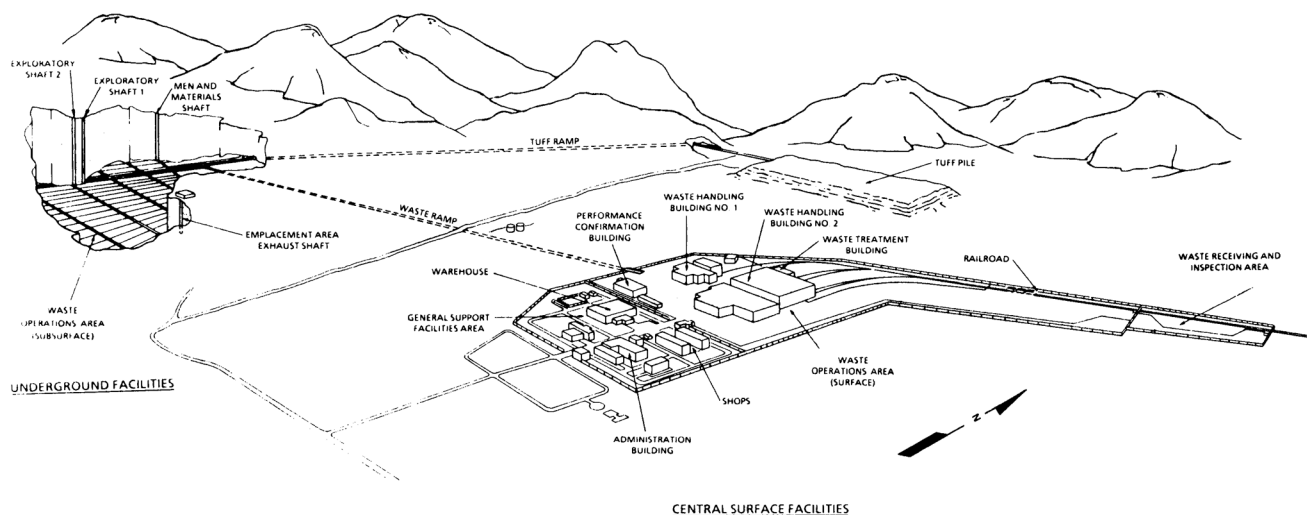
Conceptual configuration of a HLW repository at the Yucca Mountain site. (From Site Characterization Plan Conceptual Design Report⁵)
